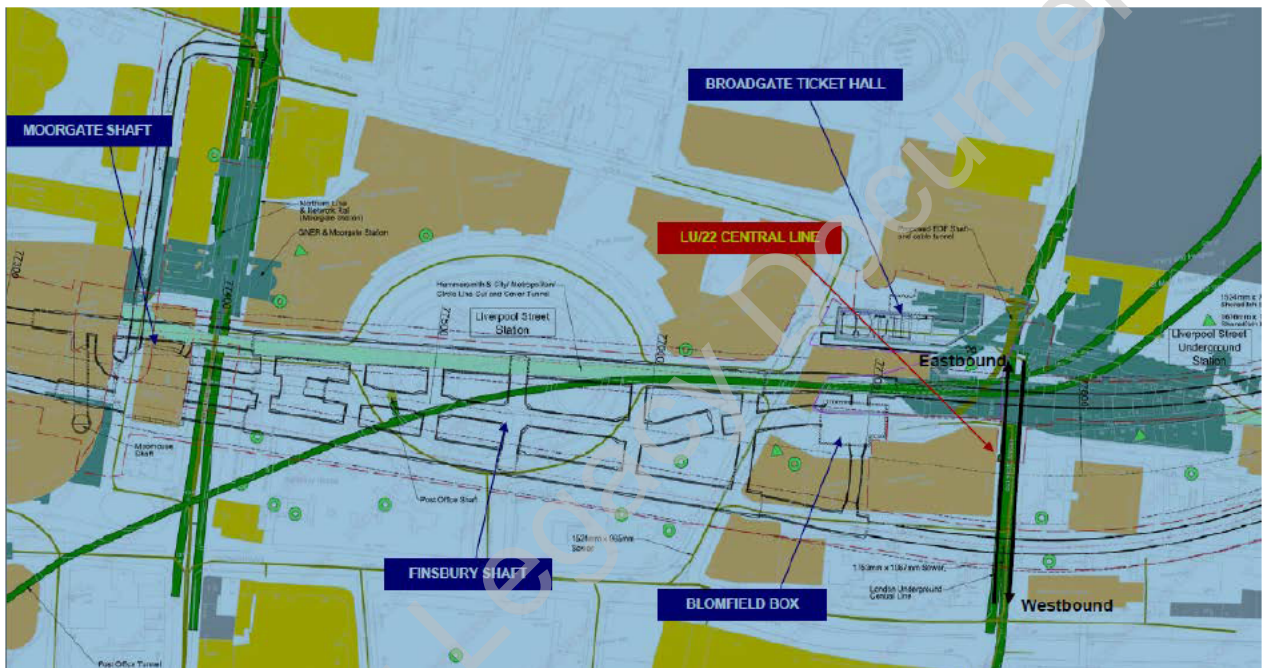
Location Plan for interface between CRL running tunnels and LU Central line EB & WB (based on drawing: C122-OVE-C2-DDA-CR001_Z-21013).
